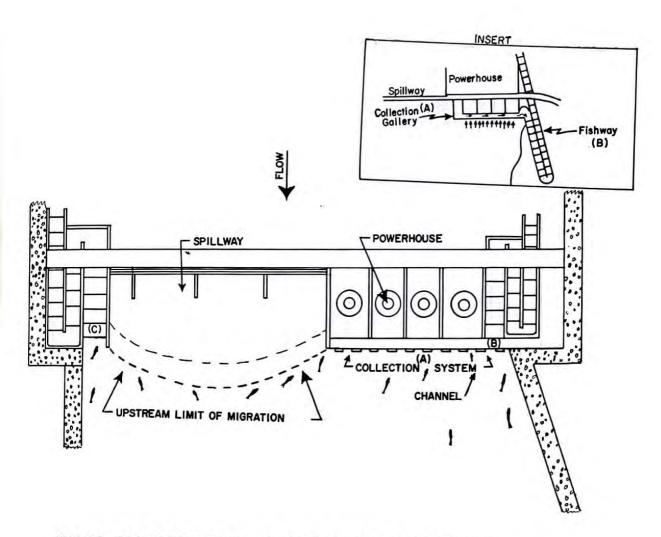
FIGURE I. DAM WITH POWERHOUSE, COLLECTION SYSTEM, AND TWO FISHWAYS
